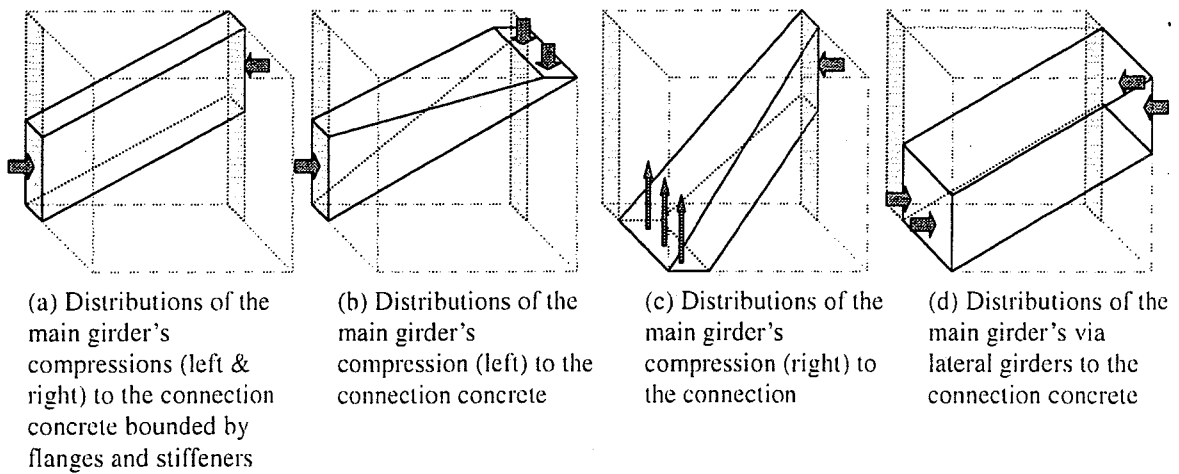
Force transfer mechanisms inside connection concrete of specimen C-1.
